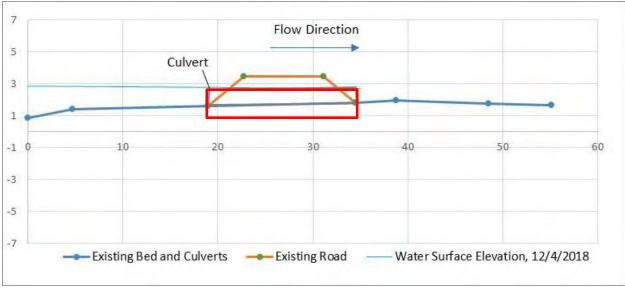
Cross section of Big Reed outflow, with proposed 2-foot culvert shown in red. Location and dimensions are approximate and would be determined in design phase.
